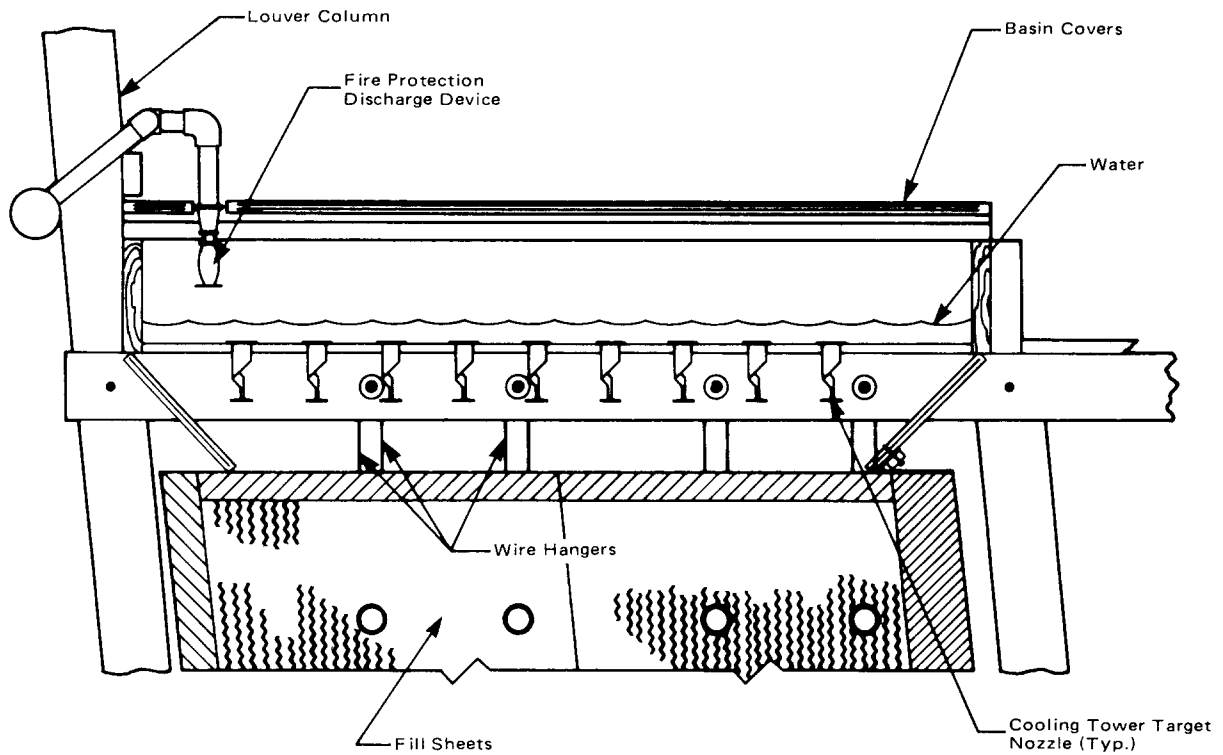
Typical deluge fire protection arrangement for crossflow towers with covers completely enclosing distribution basins.
